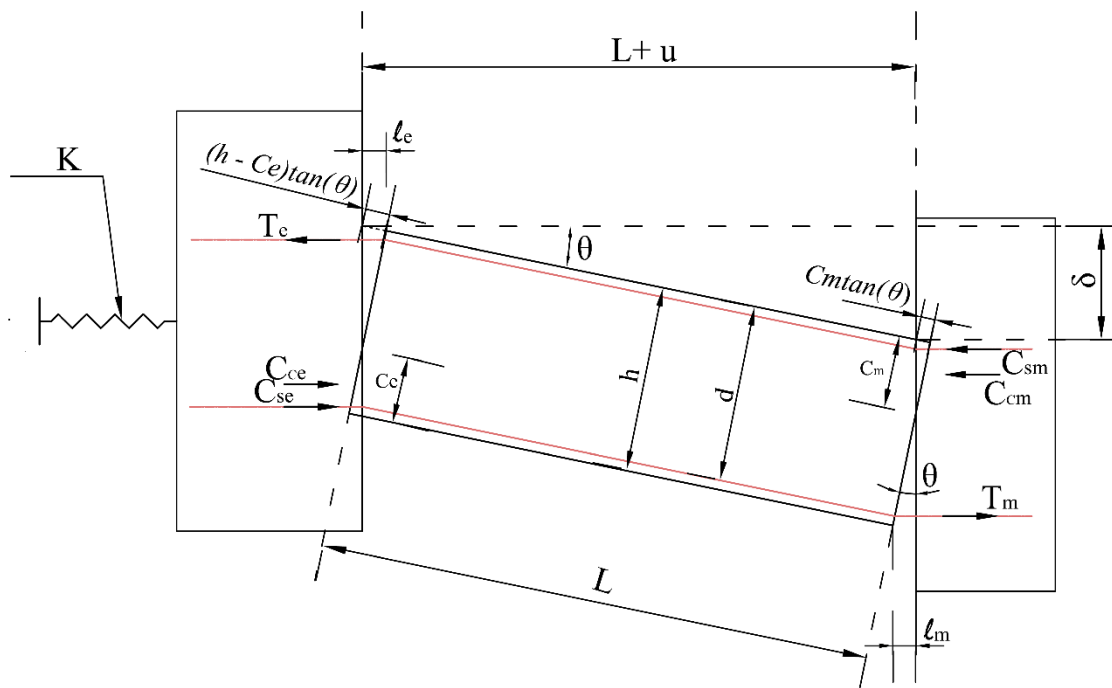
Deflected shape of single bay beam with all internal forces and deformations
